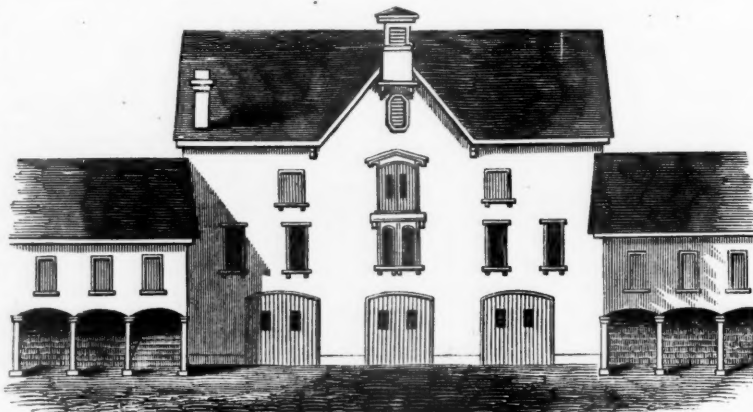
ELEVATION OF SOUTHERN SIDE.
